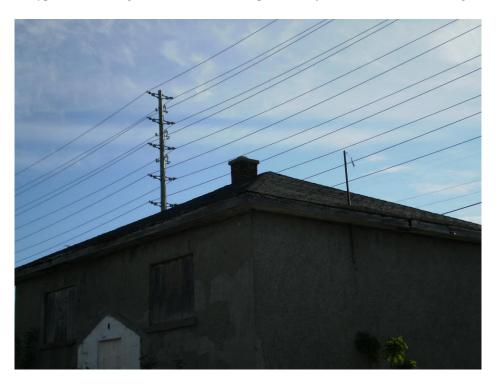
Chimney on building in the northeast portion of the site. View looking northeast
